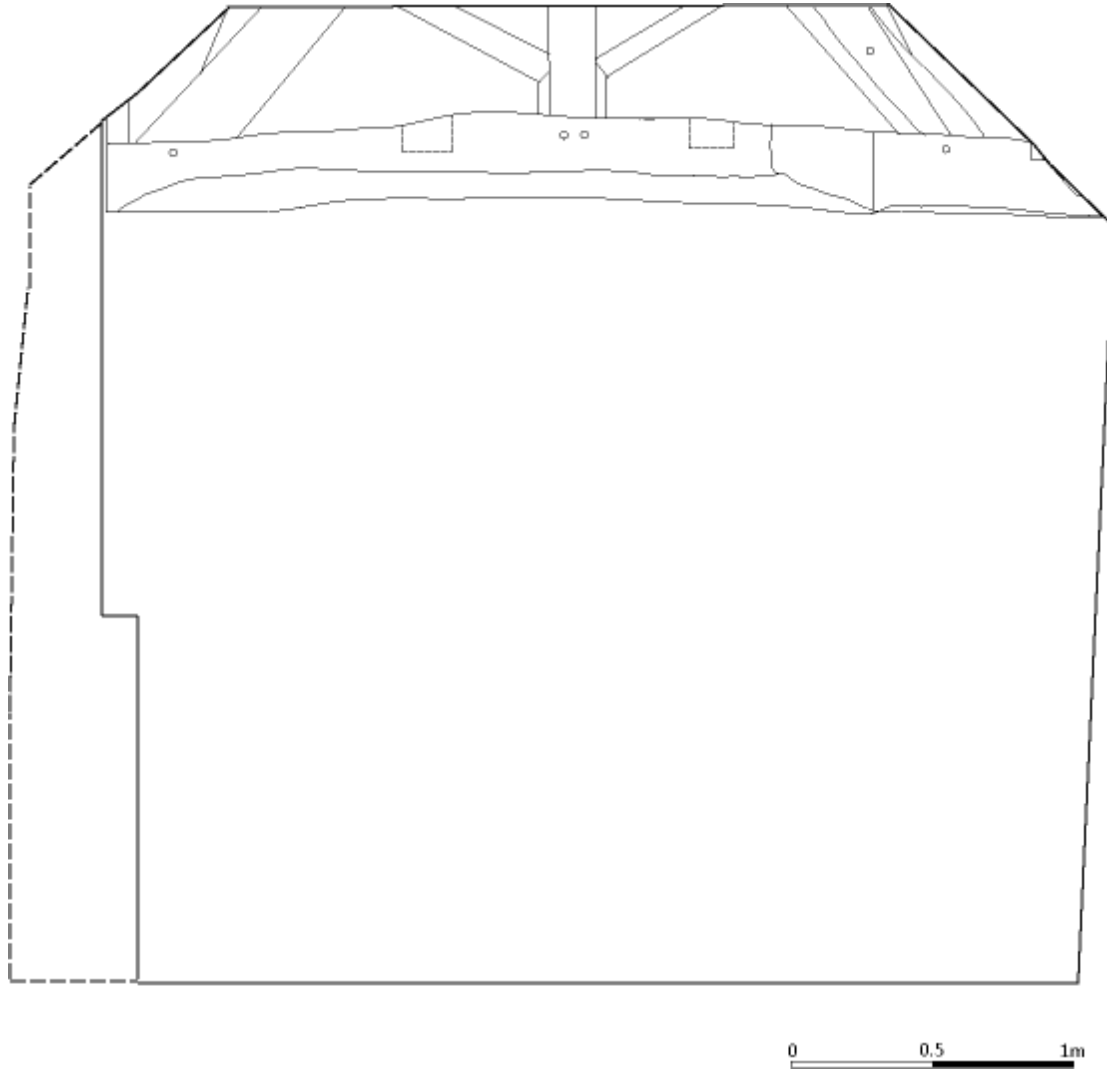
Internal cross-section of central compartment of printing works/workshop looking NW showing kingpost roof truss partially concealed by plaster coved ceiling
